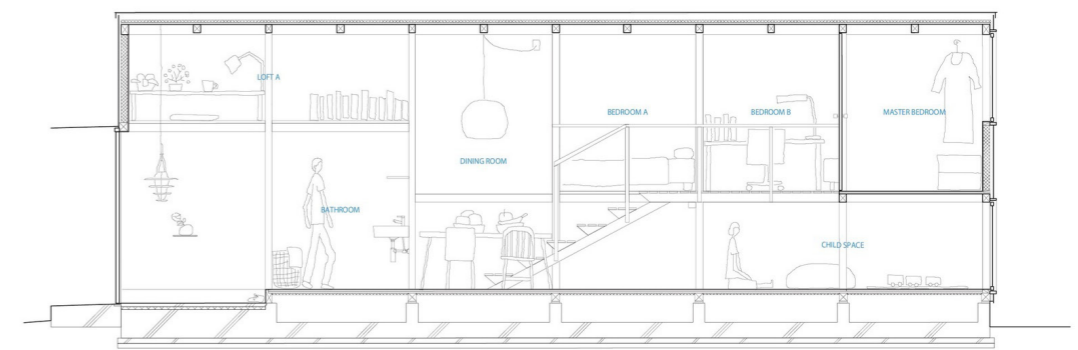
Drawing, «Section» of the K-House. © Kitamura Naoya Architects and Planners
